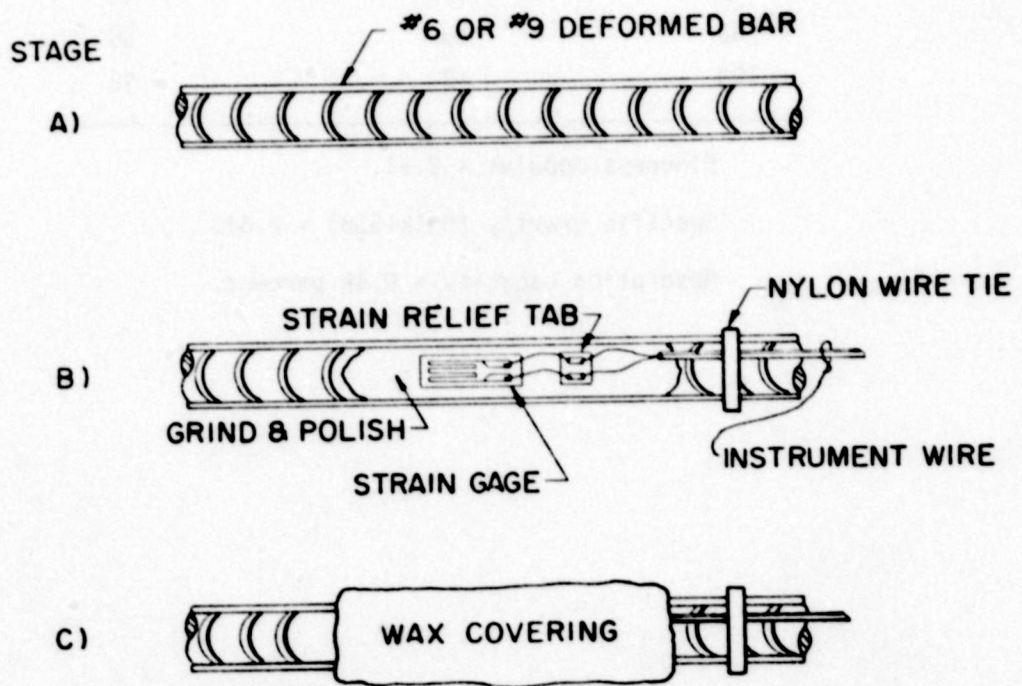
Typical Strain Gage Installation on Reinforcing Steel
